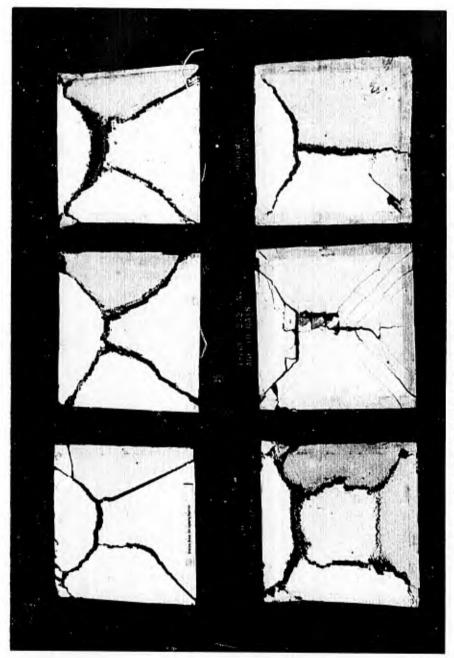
TENSION FACES OF PANELS, AS LABELLED, AFTER FLEXURAL FAILURE
